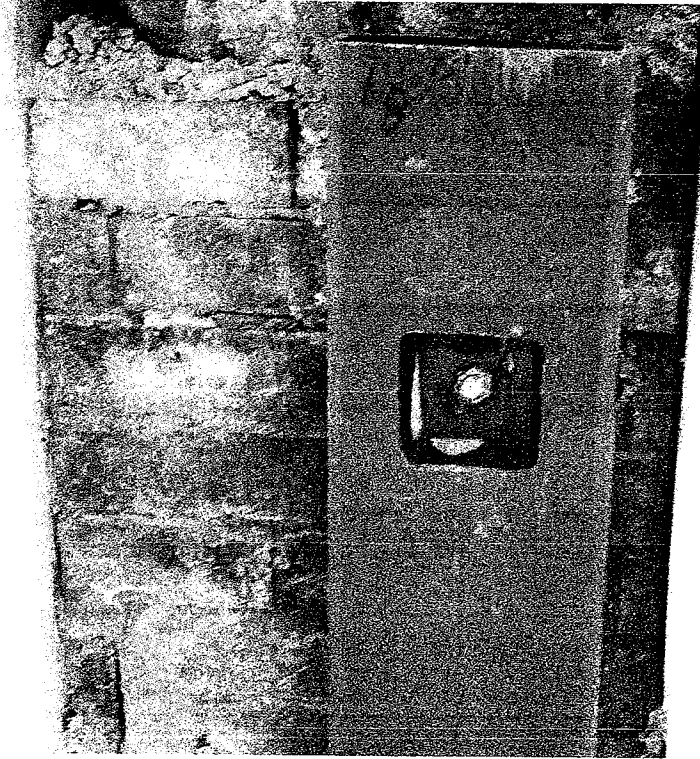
HSS 6"x2" steel tubes mounted to face of the brick at Congress Street elevation for bay windows. Note that this is one of seven locations where the epoxy adhesive used.
